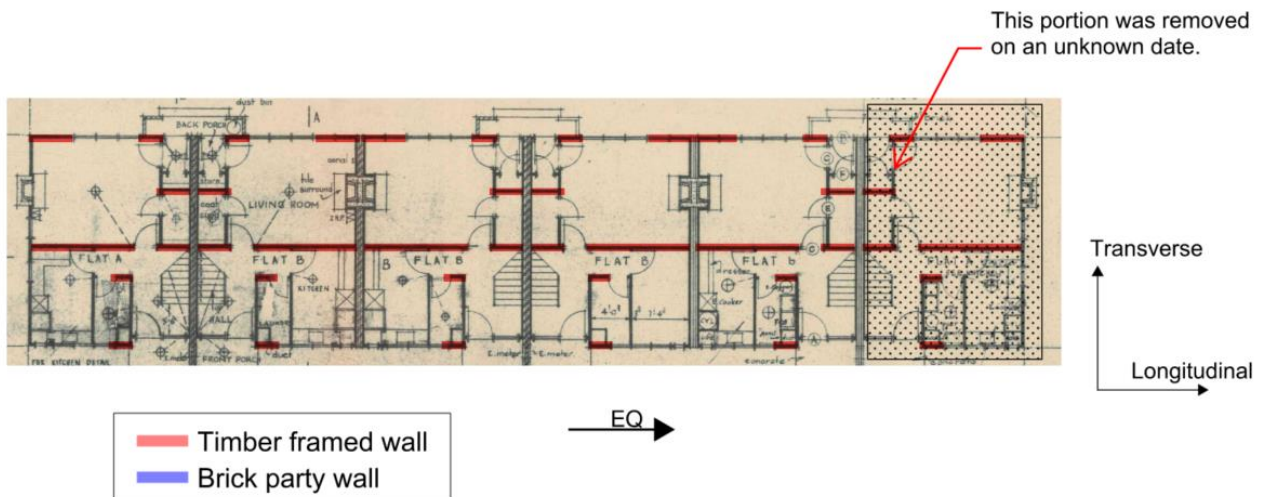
Lateral Load Resisting Elements in the Longitudinal Direction
